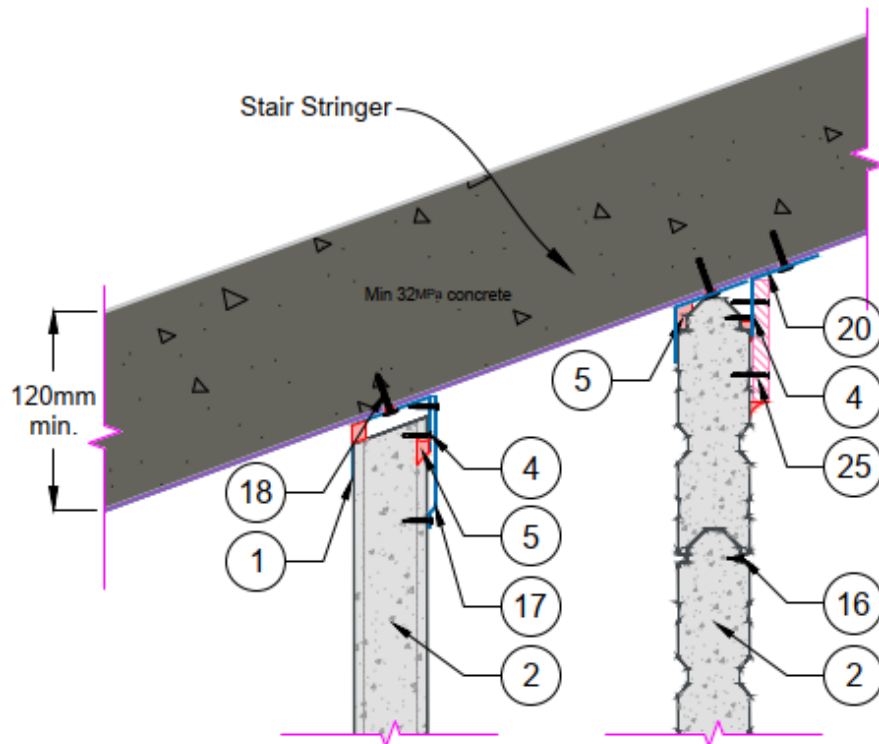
Vertical or horizontal Speedpanel wall under stair stringer (section view)
